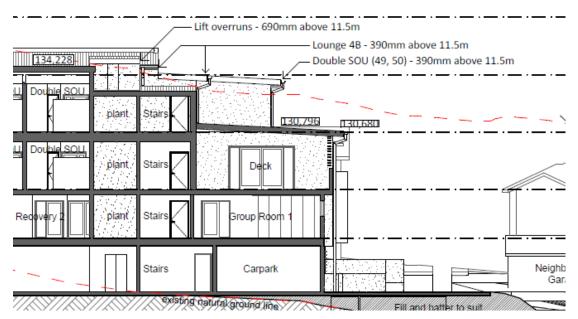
Proposed section indicating the non complaint parts of the roof (Drawing No. DA-04.02 DA7)
